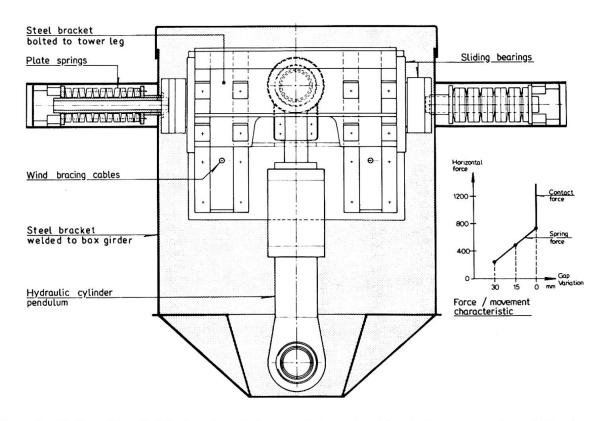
Hydraulic Cylinder Pendulum and Longitudinal Support of Stiffening Girder. (View direction is indicated in Figure 3, Cross Section A).
